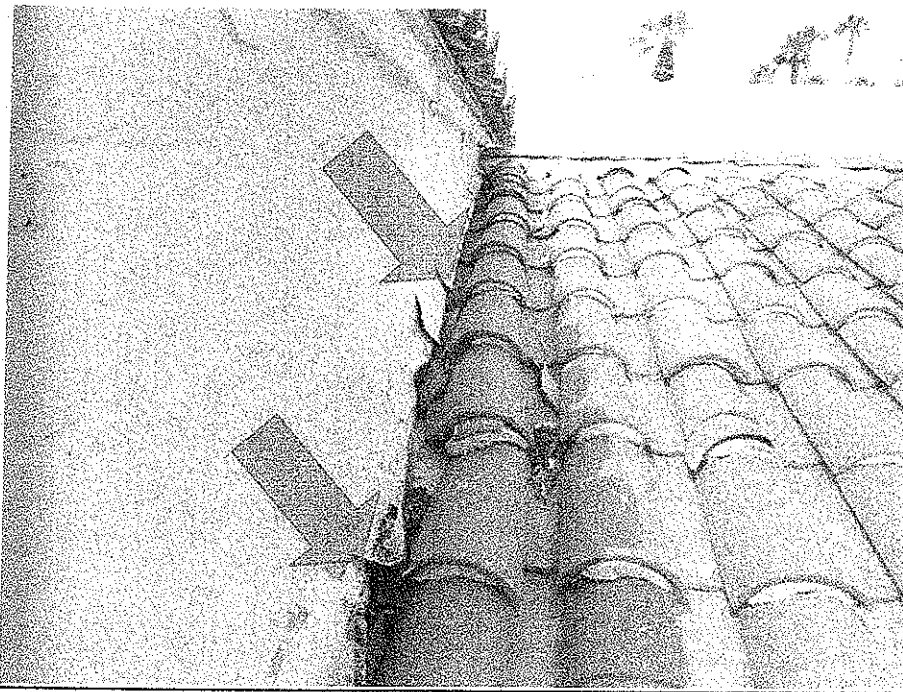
East lower roof has incomplete wall flashing installation. A water leak was reported at roof to wall transition.
